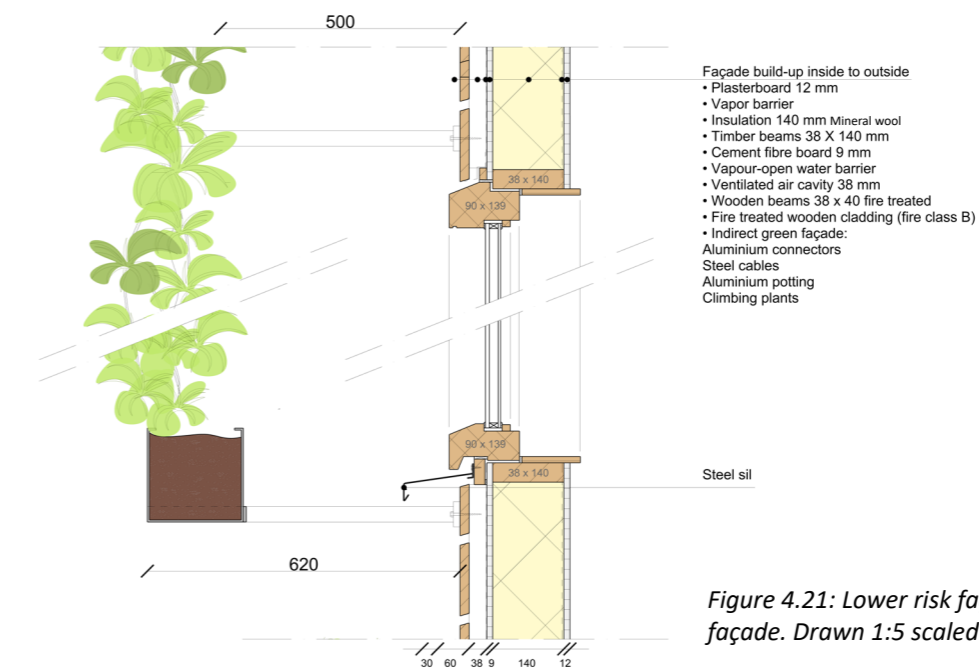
Lower risk façade detail with indirect green façade. Drawn 1:5 scaled to 1:15 (Own work)
